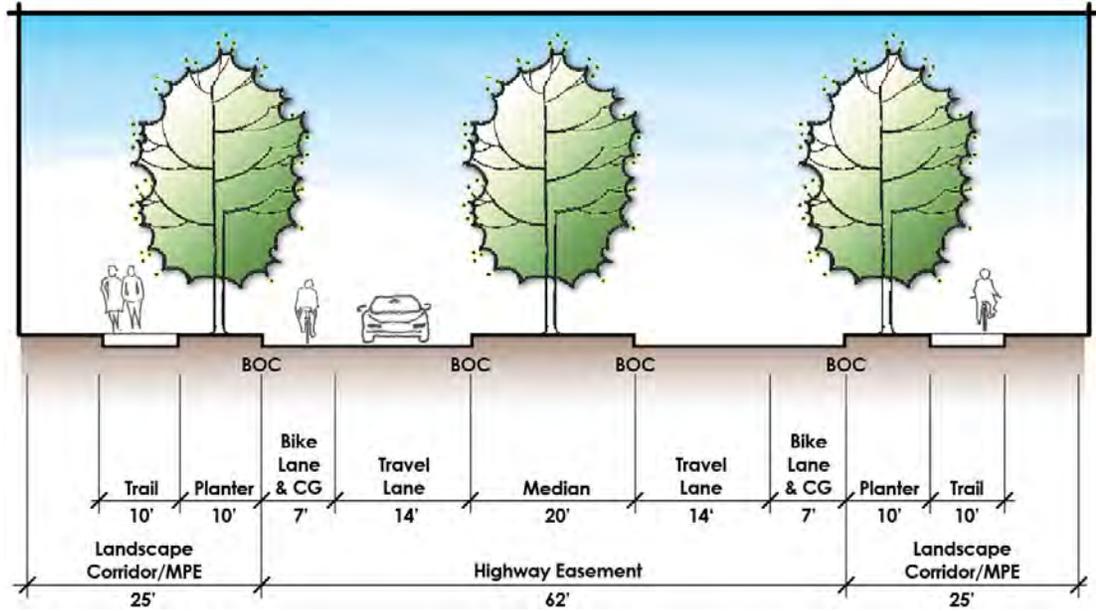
COLLECTOR STREET (CAMPUS PARK BOULEVARD)
